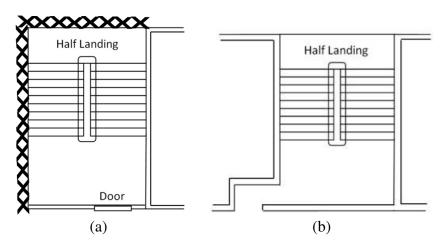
(a) Layout of Site 5 and (b) layout of Site 6.
